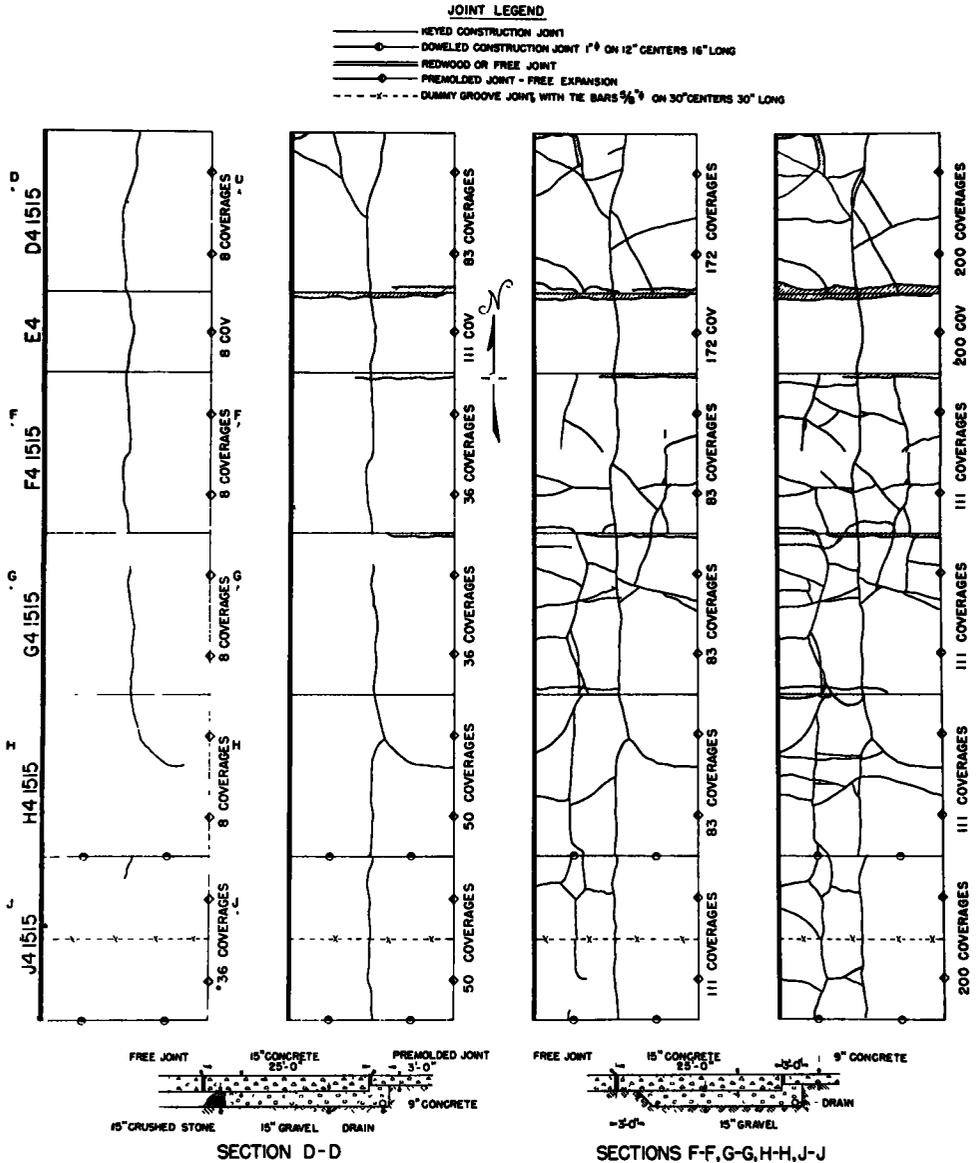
A Typical Crack Pattern Development at Lockbourne Army Air Base of a 15-inch Non-Reinforced Slab.
